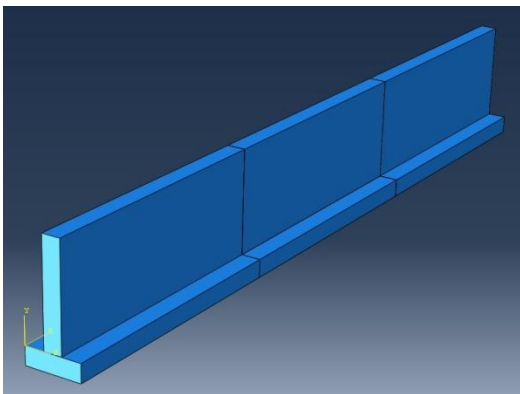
Illustration of three casting sequences for typical case wall-on-slab. In Case 1, one of the end walls is the last casting, and in Case 2 the intermediate wall is the last casting.
